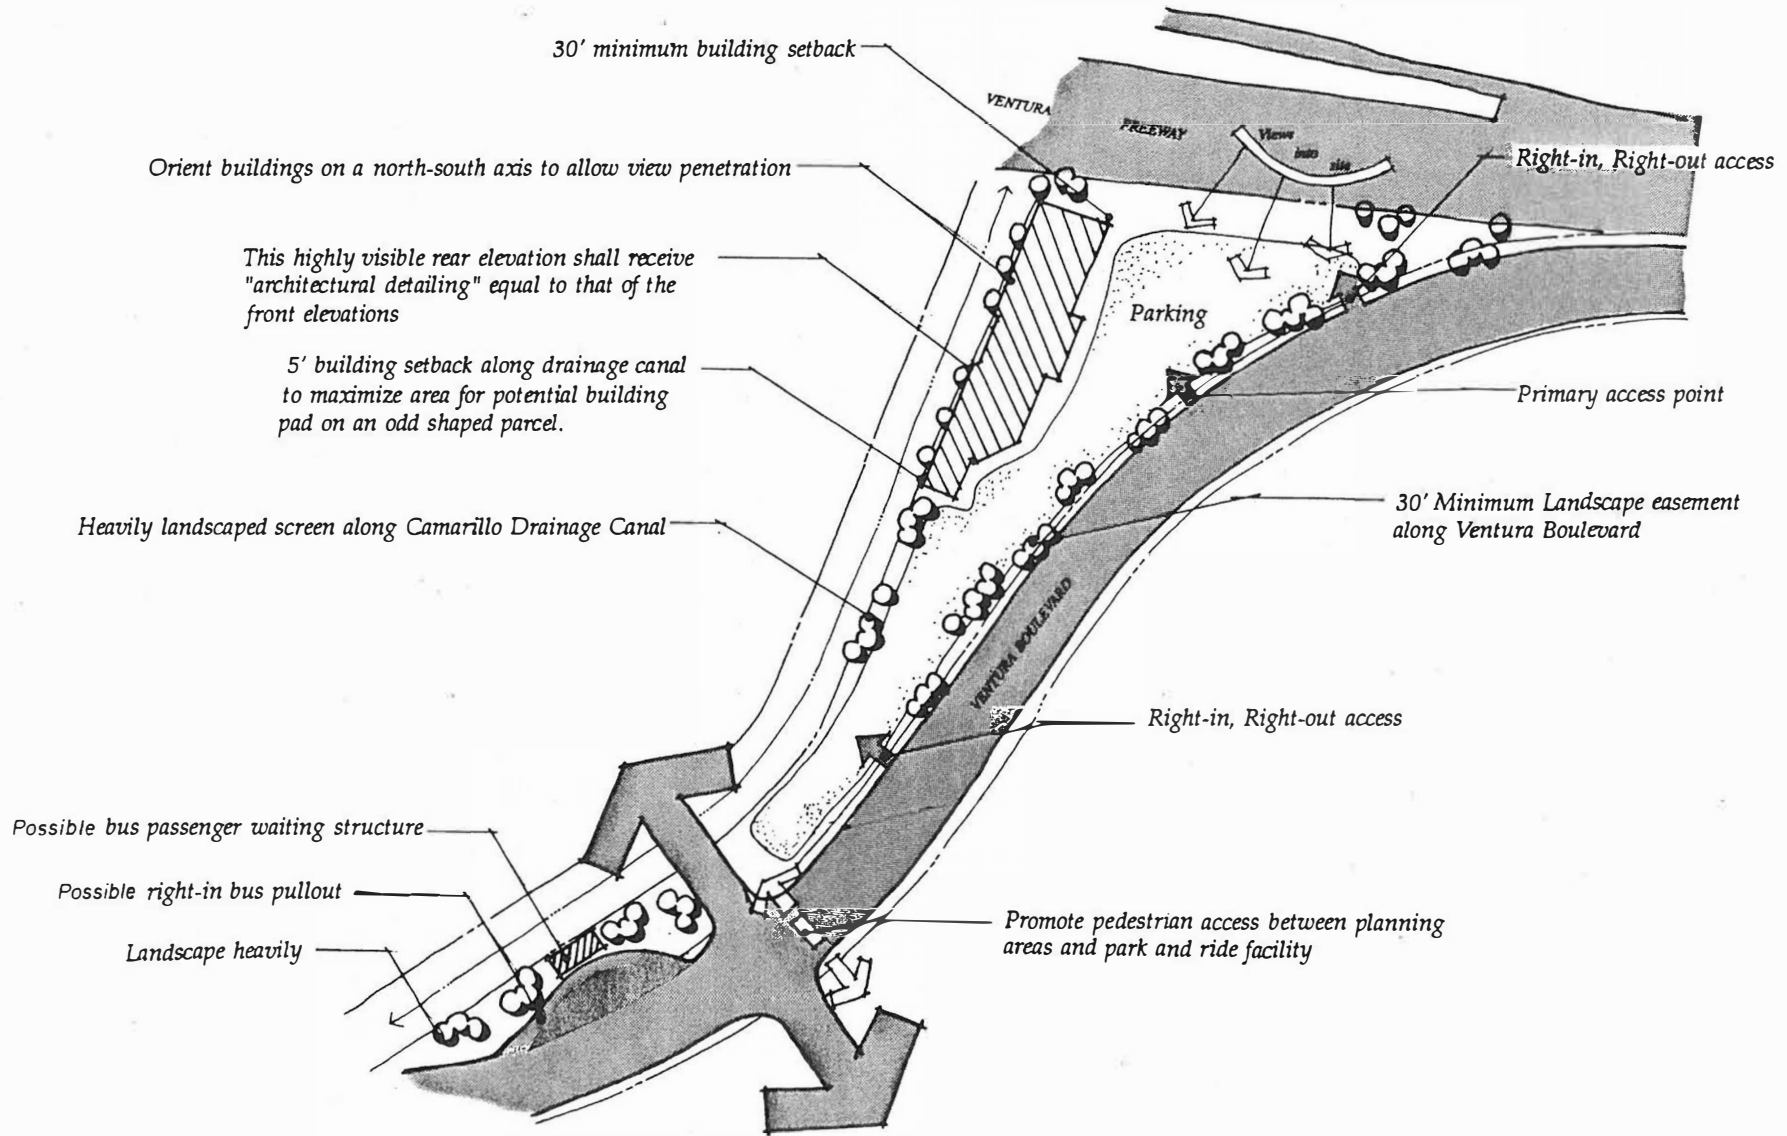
Planning Area 11 Site Planning Concept • Commercial
